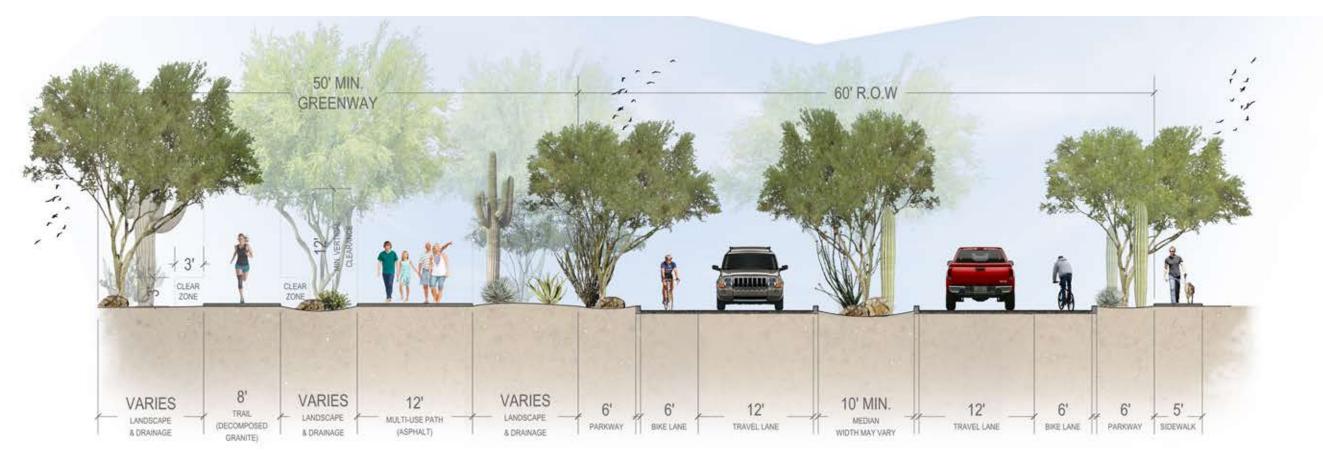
provides conceptual cross-sections for the above streets. Final determination of specific pavement widths, cross-sectional features, and provisions for on-street parking may be refined at the time of tentative platting for each residential phase.
